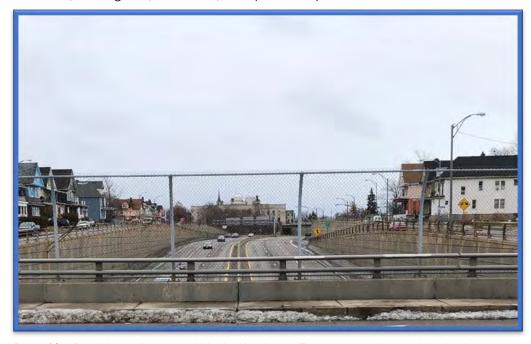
Retaining wall system within the Kensington Expressway project corridor that has an associated asbestos-containing caulking located within each expansion joint and an inaccessible/assumed asbestos-containing waterproofing located on the back sides of the abutments, retaining walls, counterforts, and tops of footer piles.
